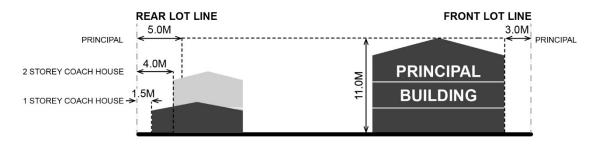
R1.0 Principal Building and SSMFH Coach House Setbacks Cross Section
